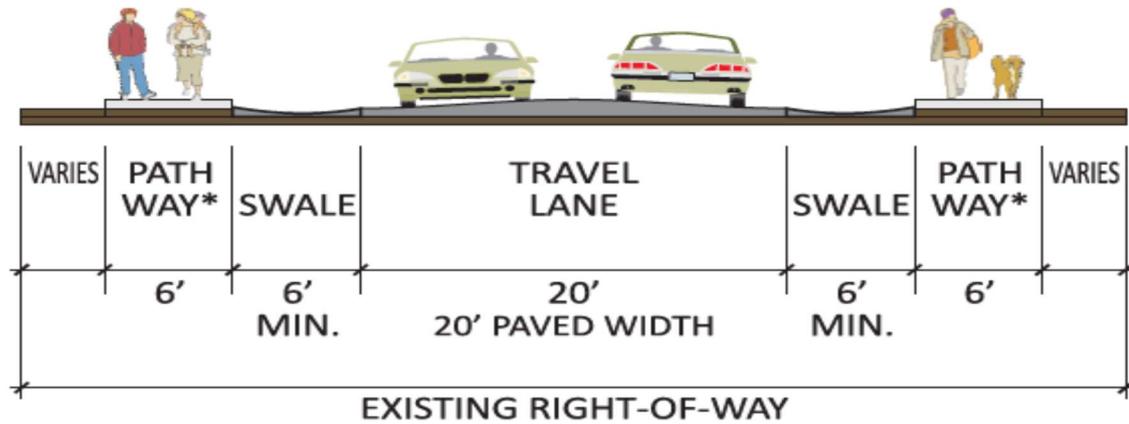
F(10) Improvement Option for Existing Unpaved Local Residential Street
